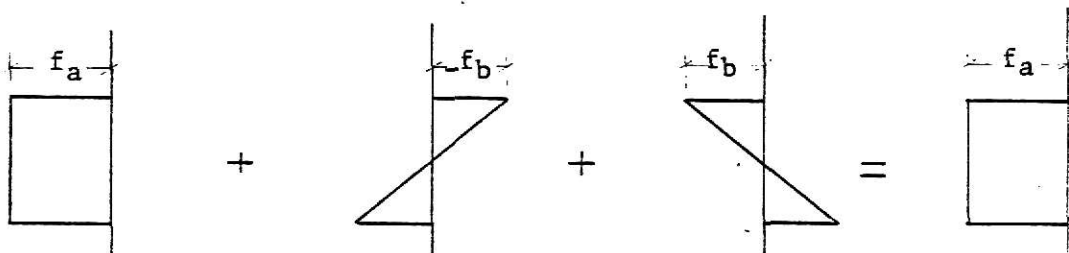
Internal Resisting Moment in Prestressed and Reinforced Concrete Beams
